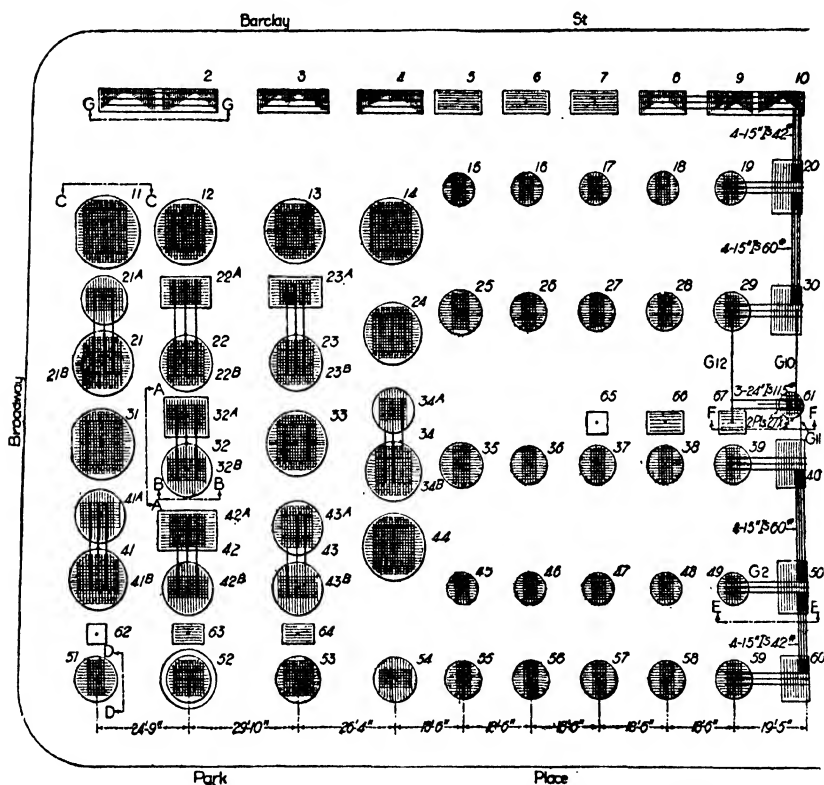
d*.—Plan of Piers and Grillages for the Woolworth Building.
